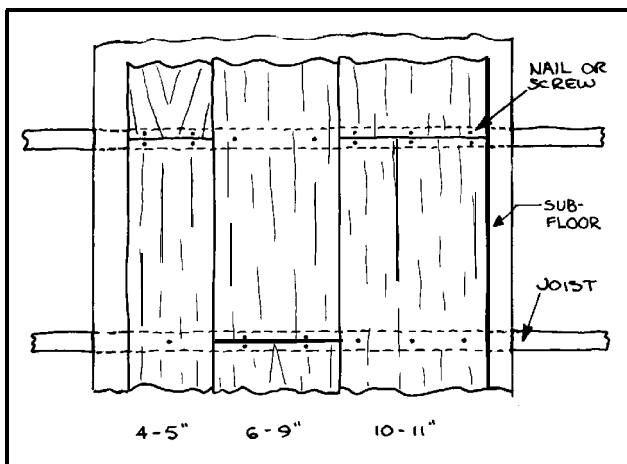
Nail or screw into joists, with the fasteners set about 5 inches apart and 1 inch in from the edges and ends.
